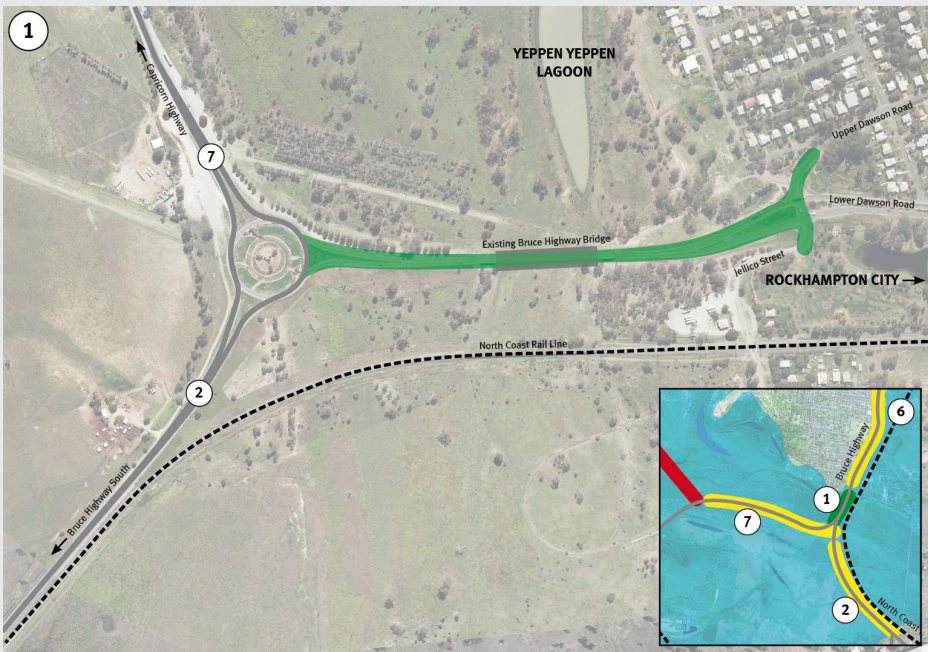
Existing Bruce Highway – Capricorn Highway to Jellico Street
